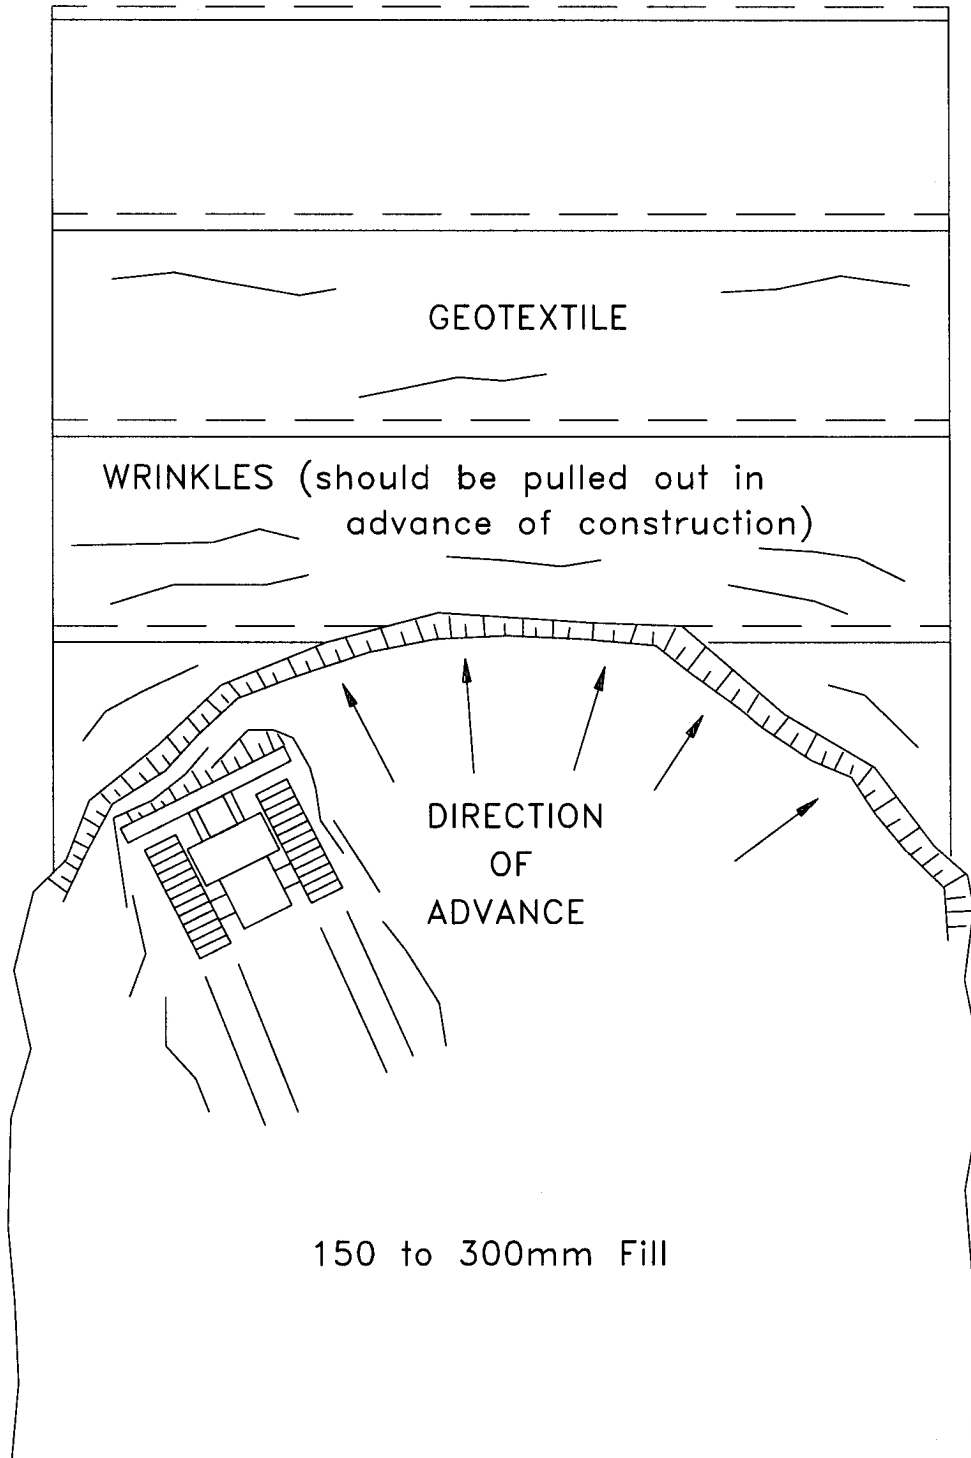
Fill placement to tension geotextile on moderate ground conditions; moderate subgrade (CBR > 1); no mud wave.
